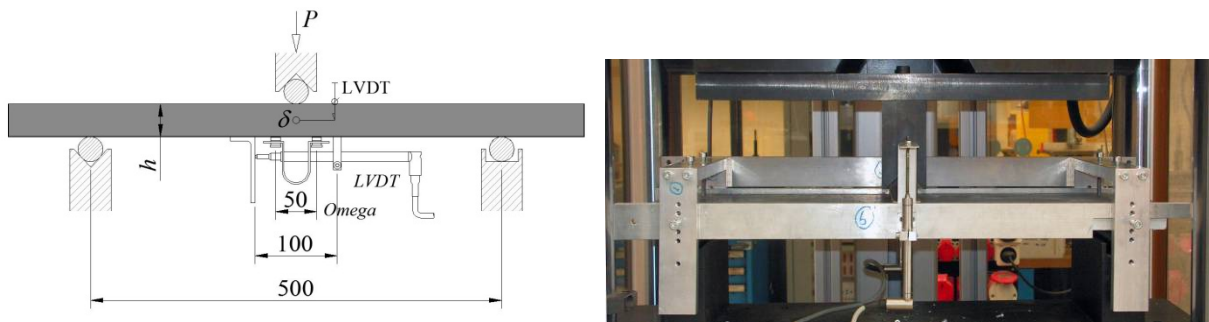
3-points bending test setup of the UHPFRC prisms
